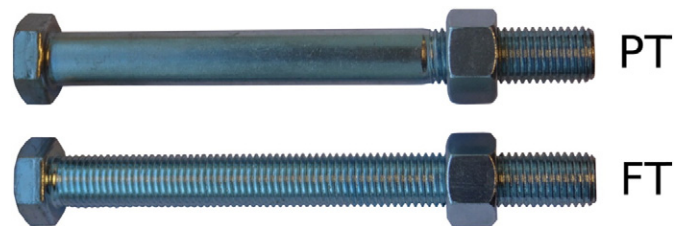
Photo of the two types of bolt and nut assemblies employed in the tests, one with a partially threaded (PT) bolt and the other with a fully threaded (FT) bolt. The grip length $L_g = 118 \text{ mm}$ for both these assemblies.
